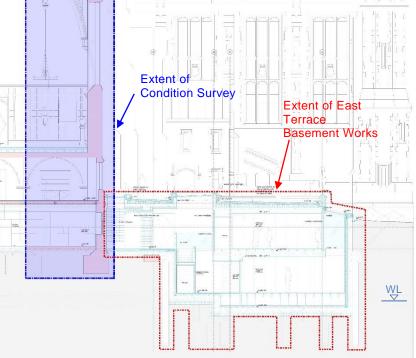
Typical East Terrace Section – Rick Mather Architects
